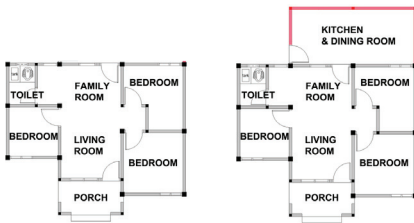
This house, built by the Saudi-funded agency Saudi Charity Campaign (SCC), is shown right in its unmodified form. The house is far larger than the average reconstruction house, with more bedrooms and higher ceilings. The modified plan, on the right of the plan, shows that a new room with cooking and dining facilities has been built to the edge of the property boundary at the rear of the house
